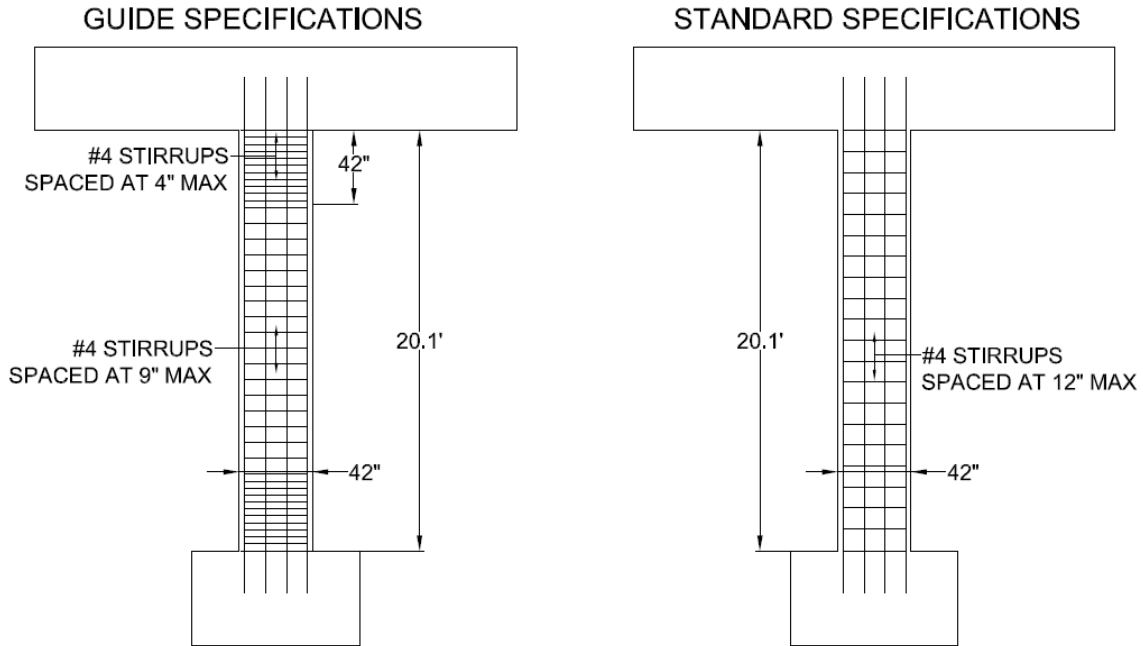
Bent Creek Road Bridge Bent 2 Final Design Details (SDC A2)
